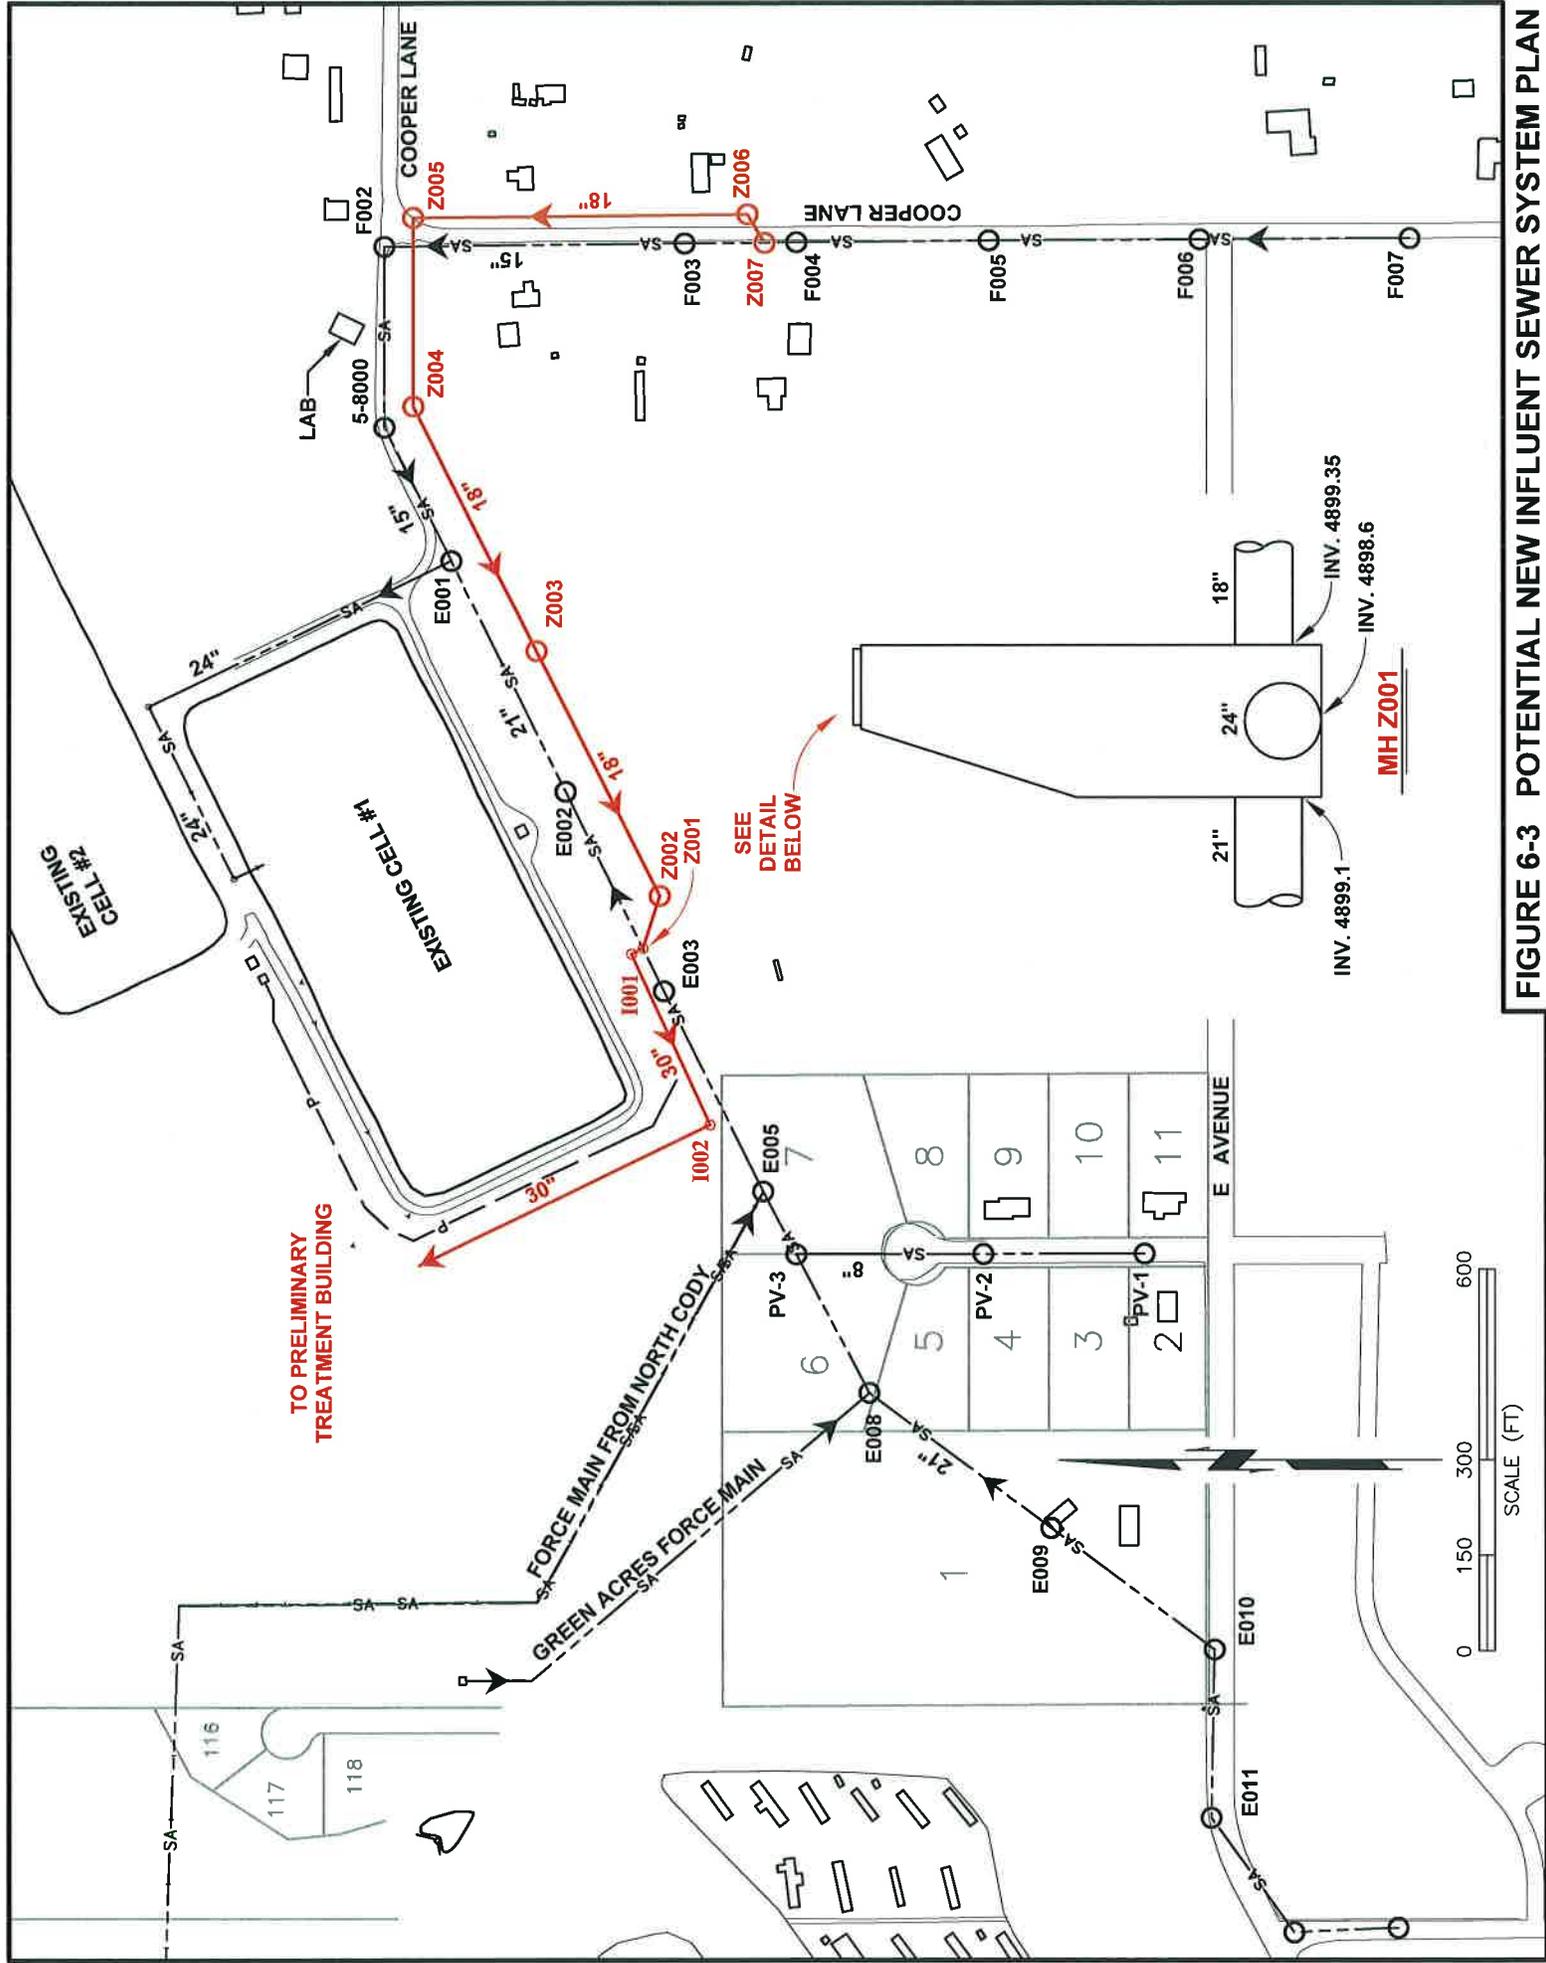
POTENTIAL NEW INFLUENT SEWER SYSTEM PLAN
